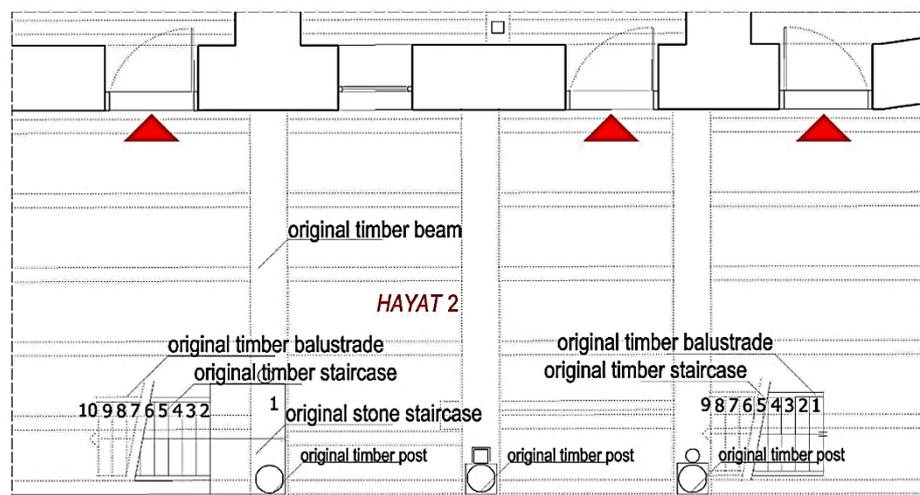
The plan of the *Hayat 2*, house numbered 151.
